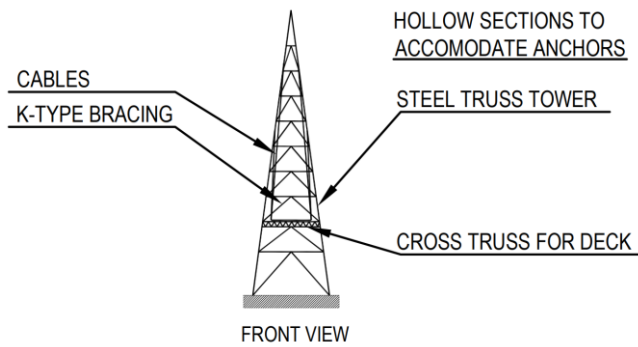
Front view of Cable Stayed Bridge with Steel Trussed Pylon.
